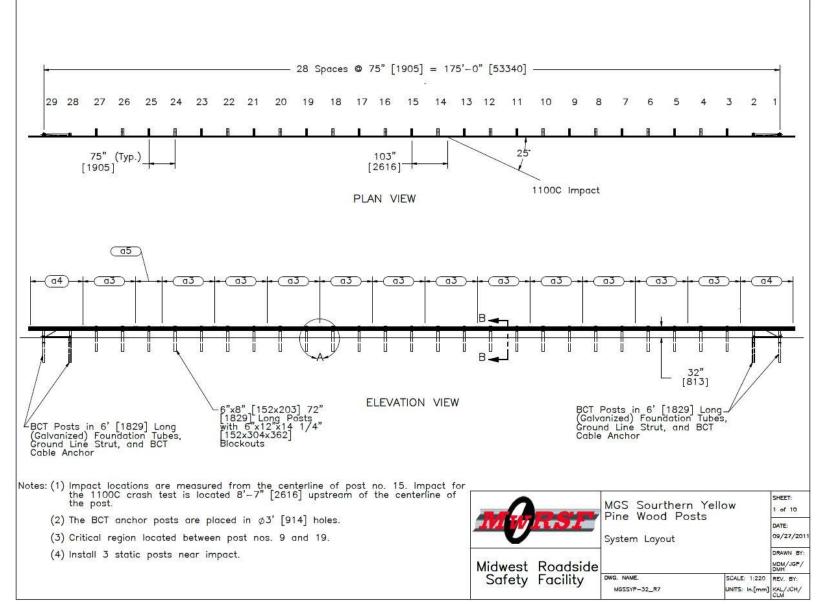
Test Installation Layout, Test No. MGSSYP-2
